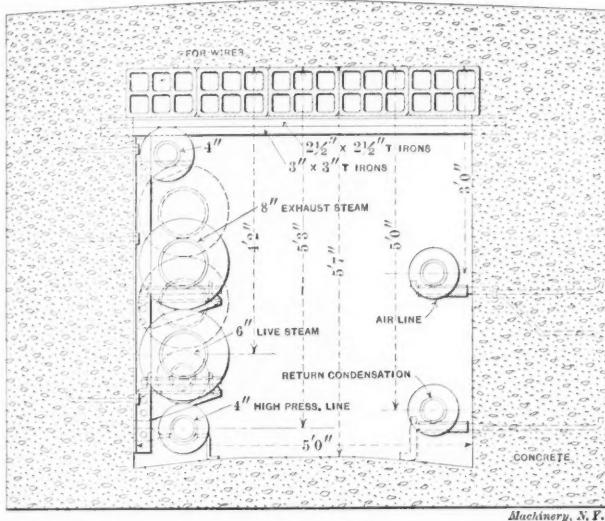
Cross-section of Tunnel used for Pipes and Electric Conductors only.
